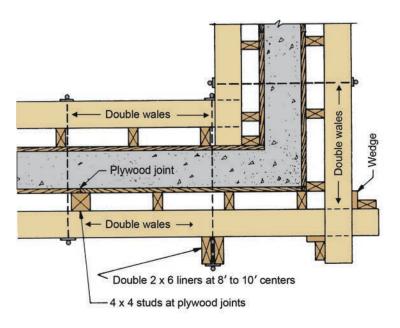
Typical details of straight wall forms showing one method of securing a tight corner (Image courtesy Portland Cement Association)
